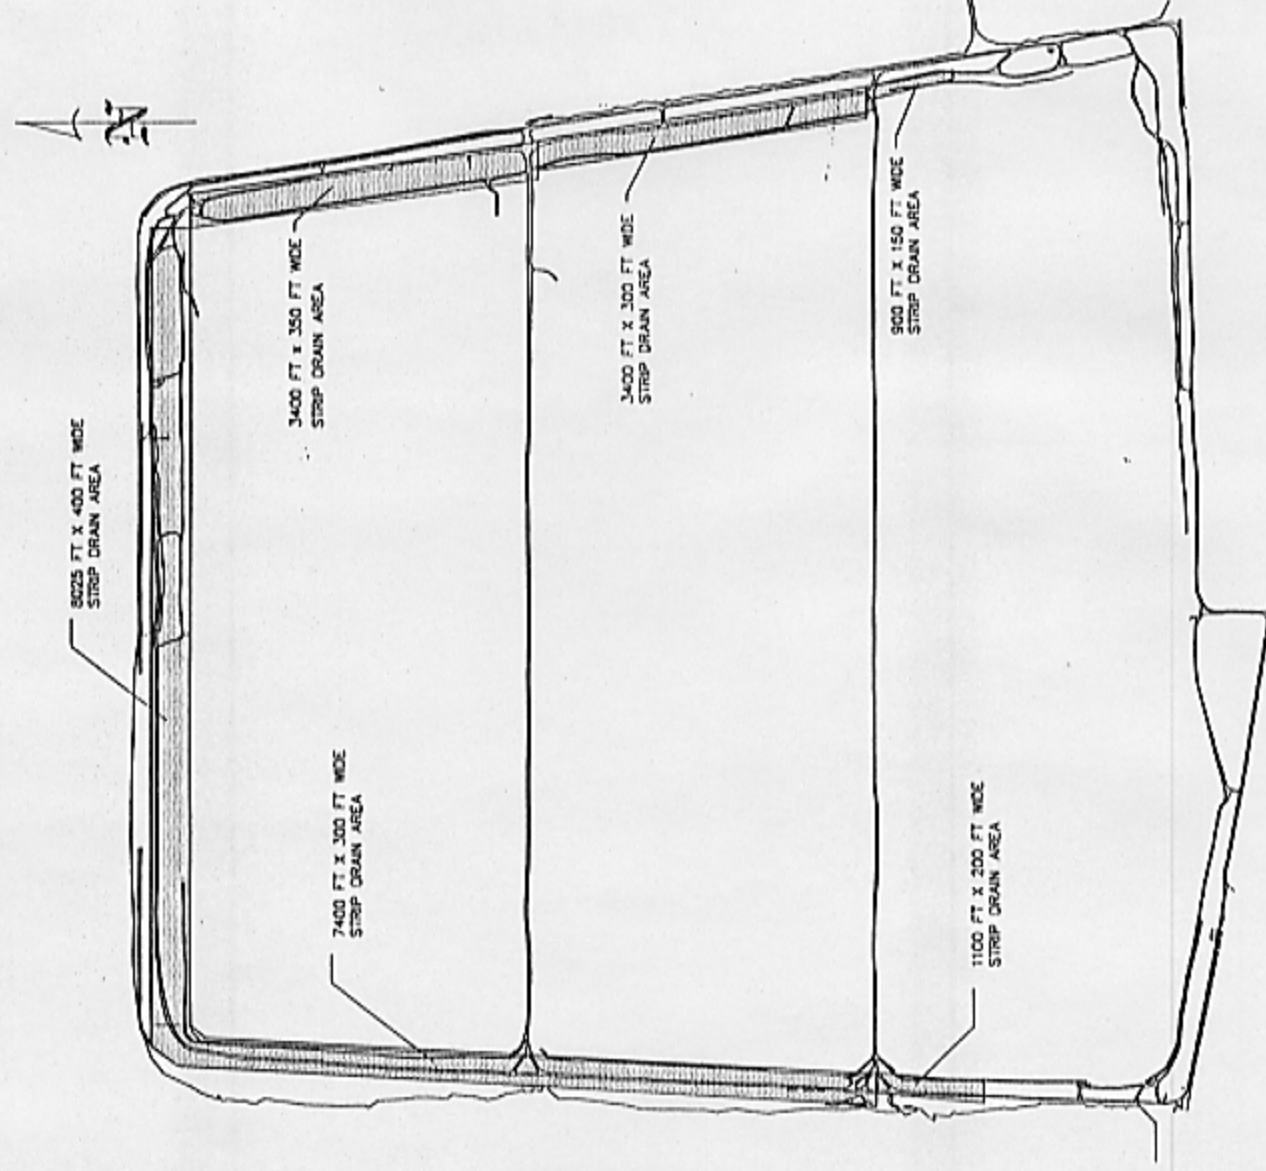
Proposed Areas of Vertical Strip Drain Installation, Crane Island
